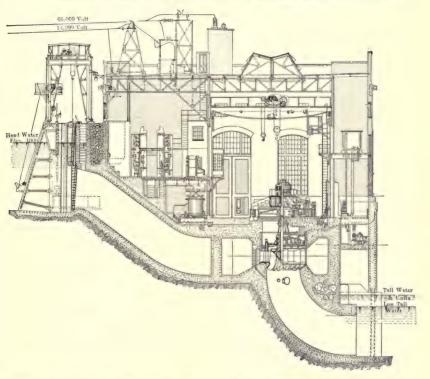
Sectional Elevation of Power House, Turners Falls Power and Electric Company, Showing Headgate Arrangement.
